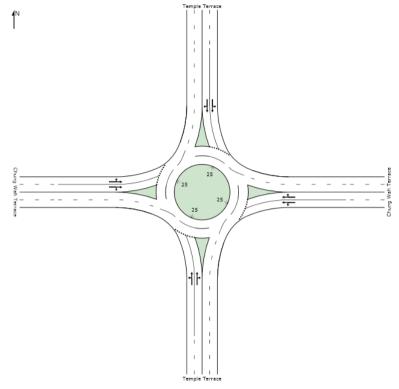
Sidra Model Layout Temple Terrace / Chung Wah Terrace Intersection
